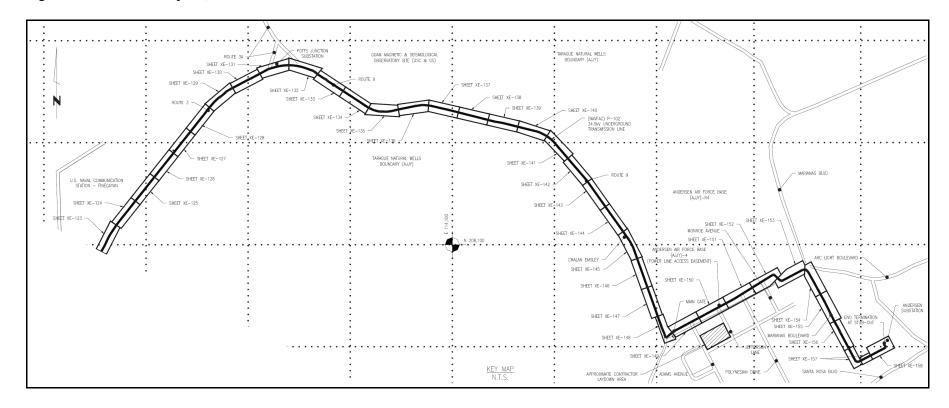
P-102 Site Layout, Route 3-Route9-AAFB
